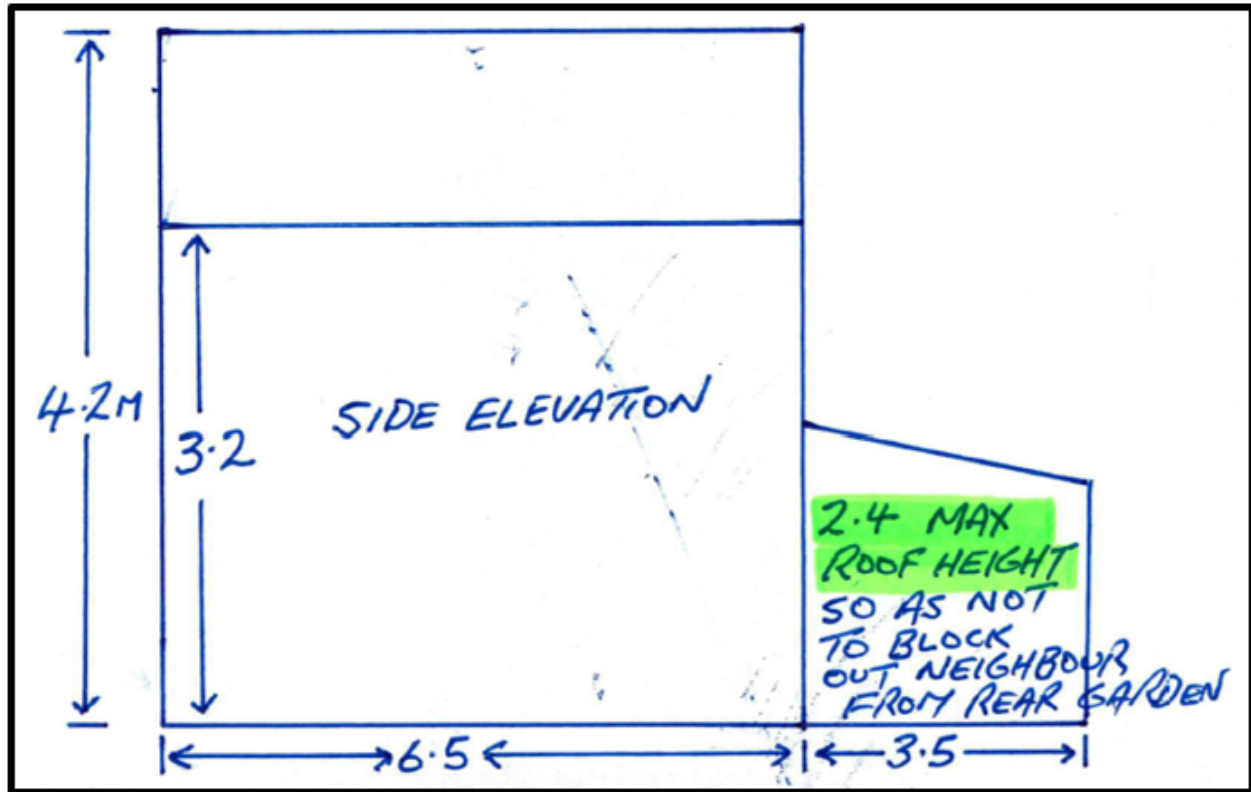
Elevation Plan of the Outbuilding with the attached Patio (Lean-To) at the rear
